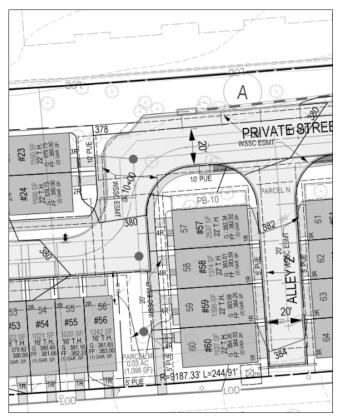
Sidewalk Facilities Along Eastern End of Proposed Street B
